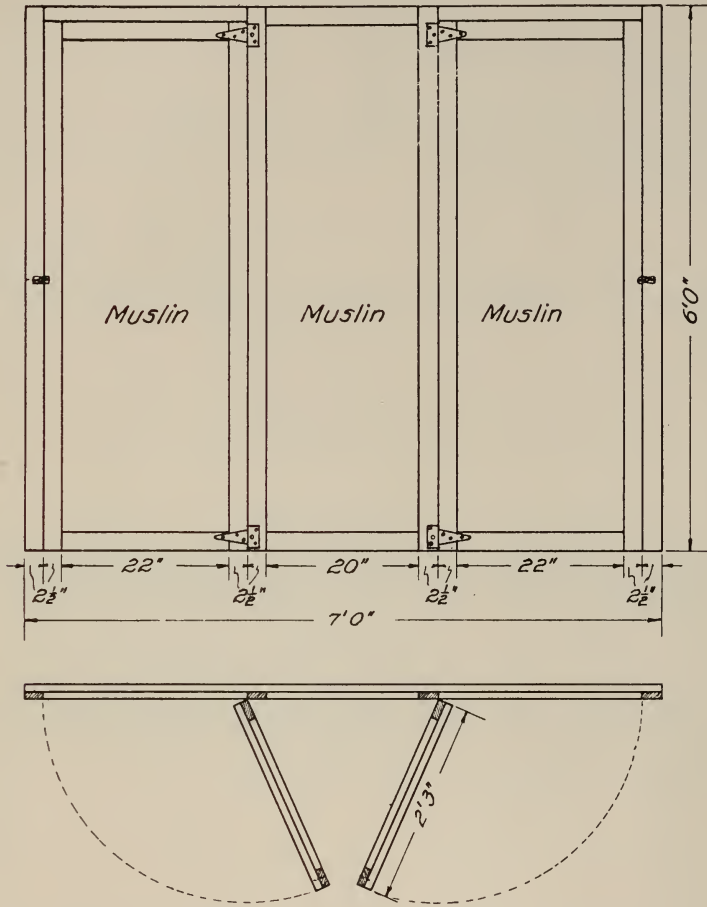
Detail of curtain for commercial laying house. For further construction details see figure 11.
